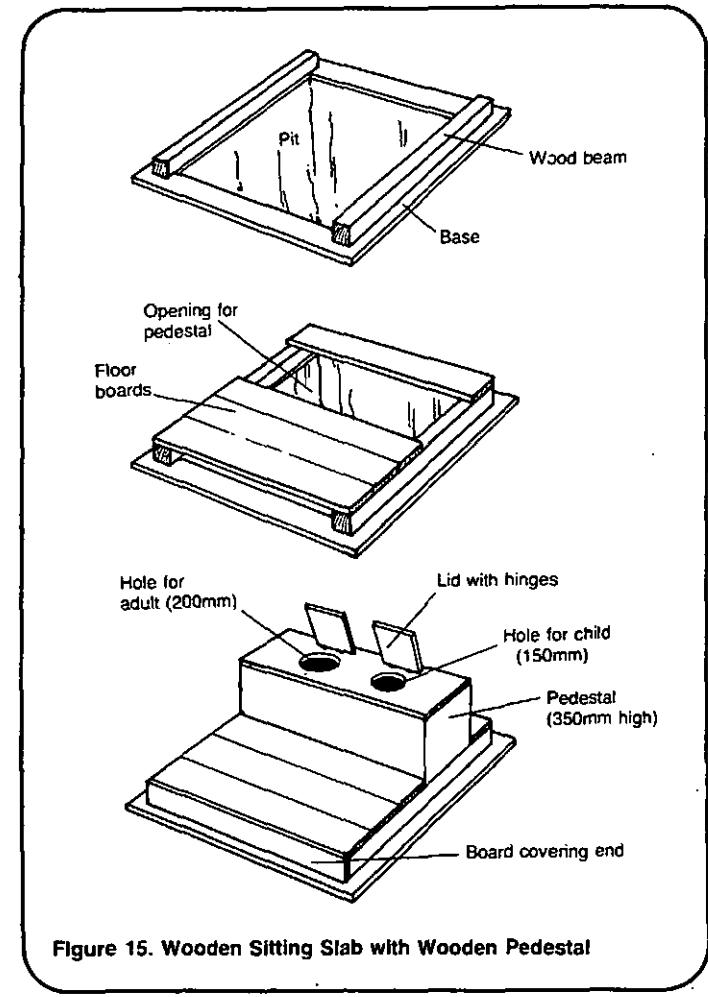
Wooden Sitting Slab with Wooden Pedestal
